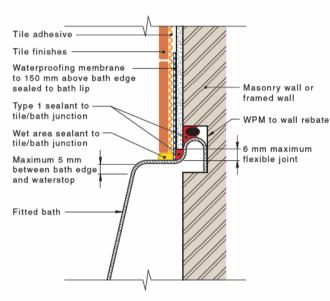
(A) — Shower over bath — Fitted bath — Framed or masonry walls
